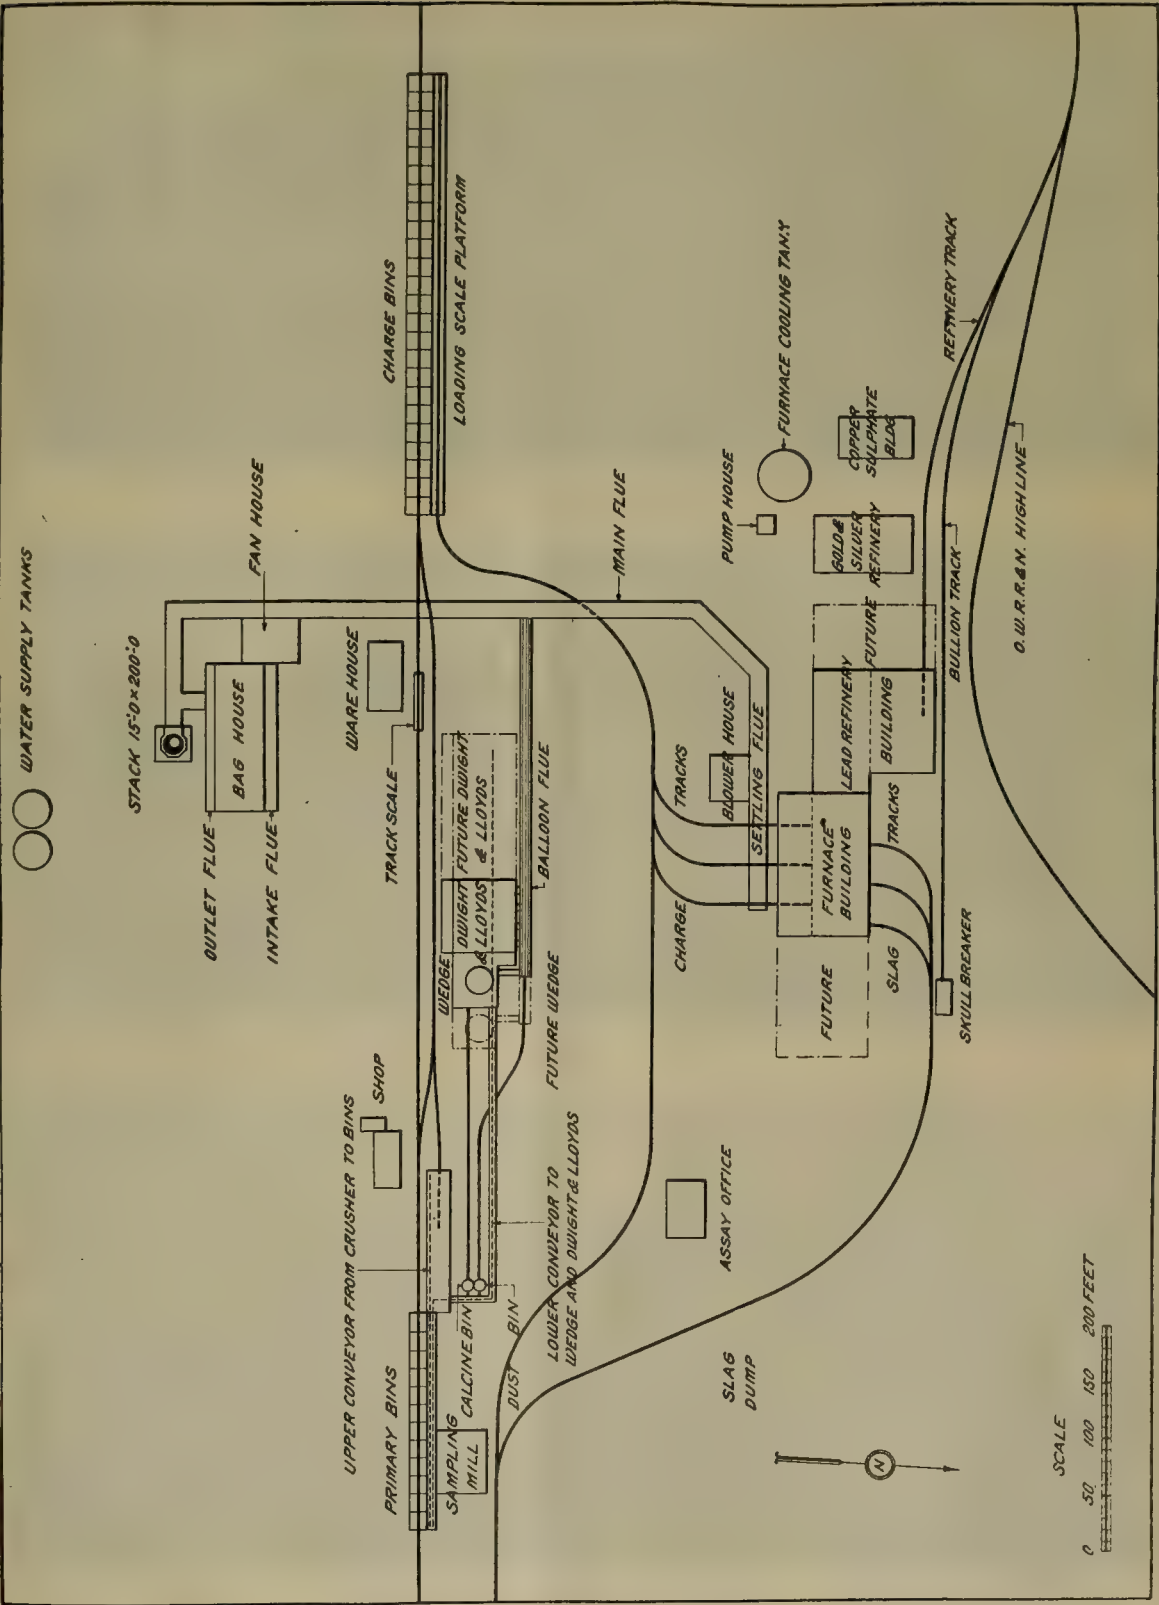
PLAN OF THE BUNKER HILL SMELTER
